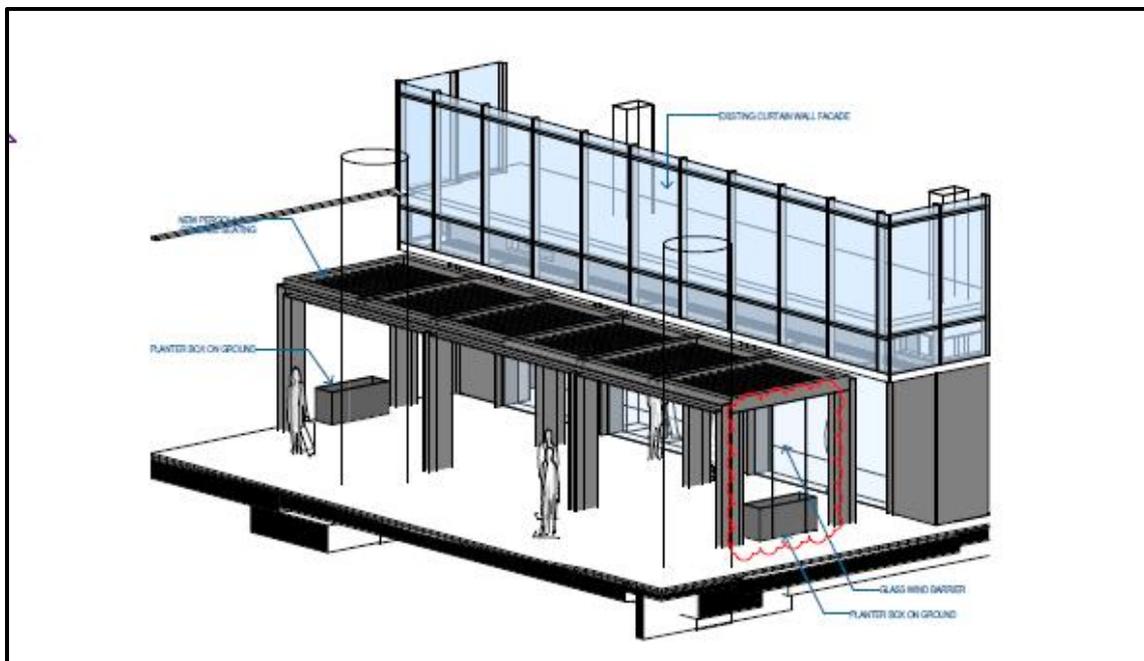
Pergola façade details adjacent to Retail R12 (Urban Park level).
